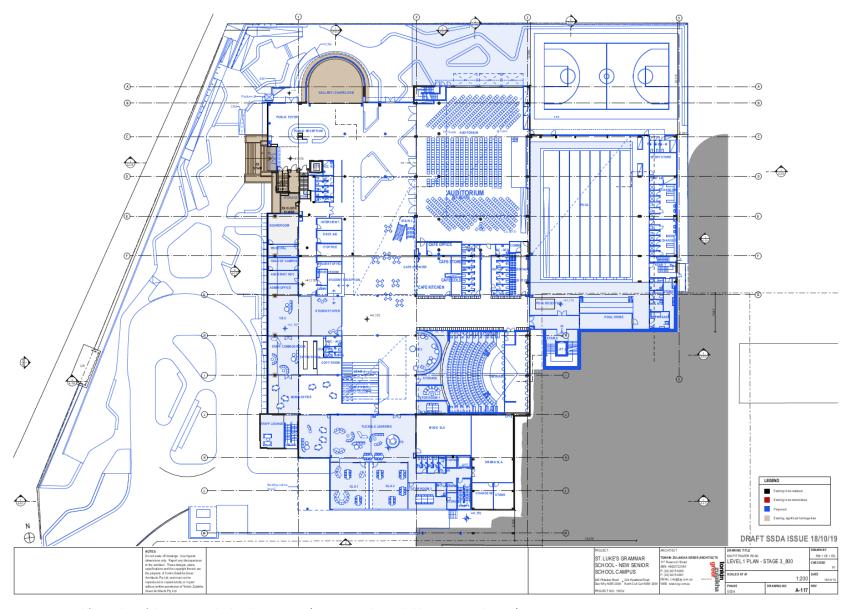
Ground floor plan of the proposed school expansion (Source: Tonkin Zulaikha Greer Architects)
